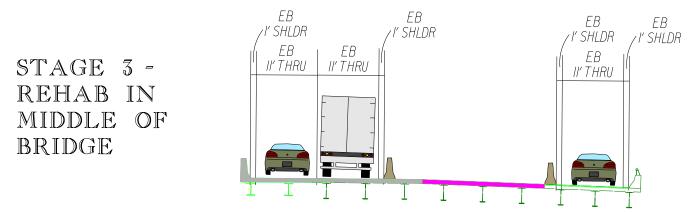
Split through traffic on I-64 EB bridge over Tidewater Drive
